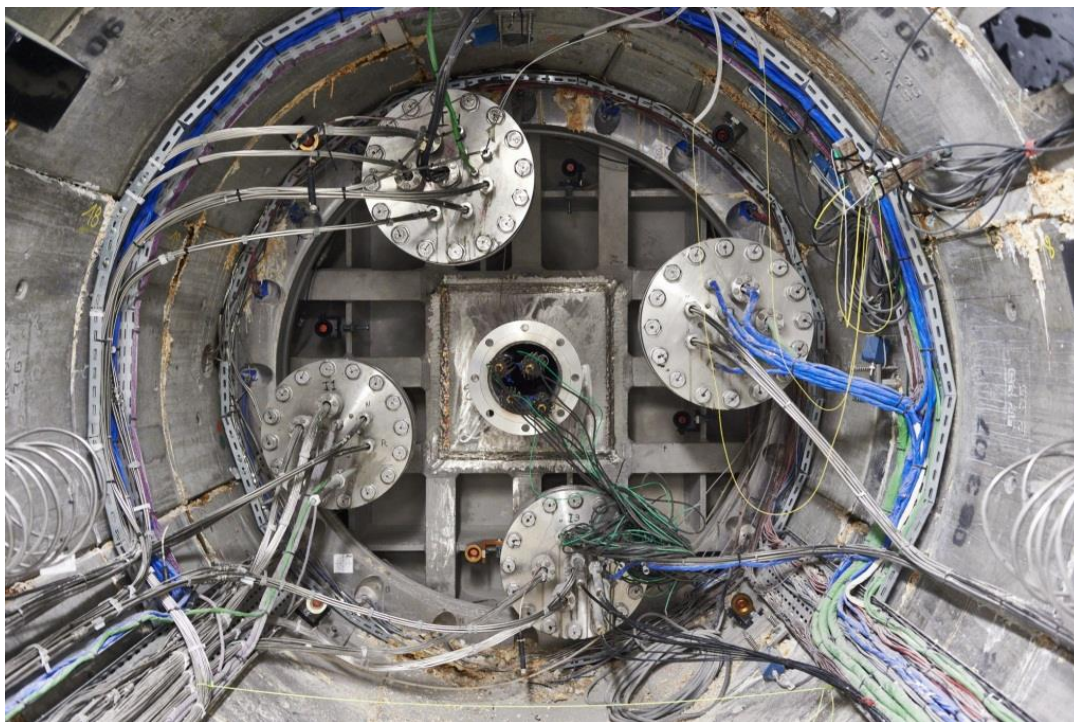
Four instrumentation flanges carried the major part of the sensor cables and piezometer tubes to the external sensors or directly to the data acquisition.
